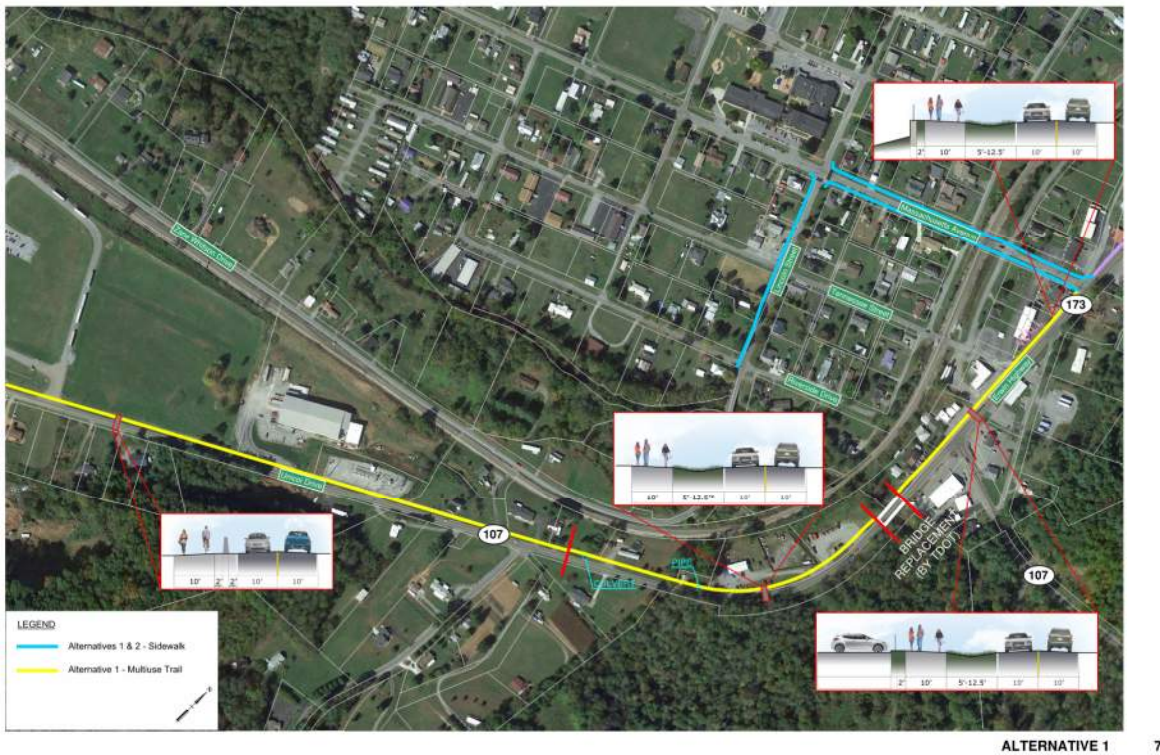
Erwin and Unicoi Recommended Alternatives 1 – Plan Sheets Page 8
